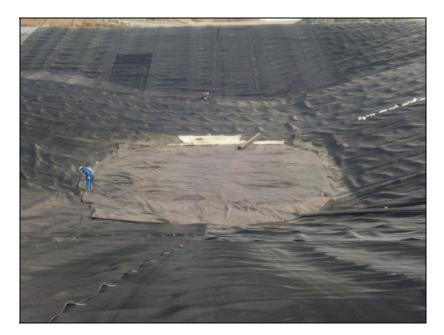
Geotextile wrapped around the LCRS drain rock
